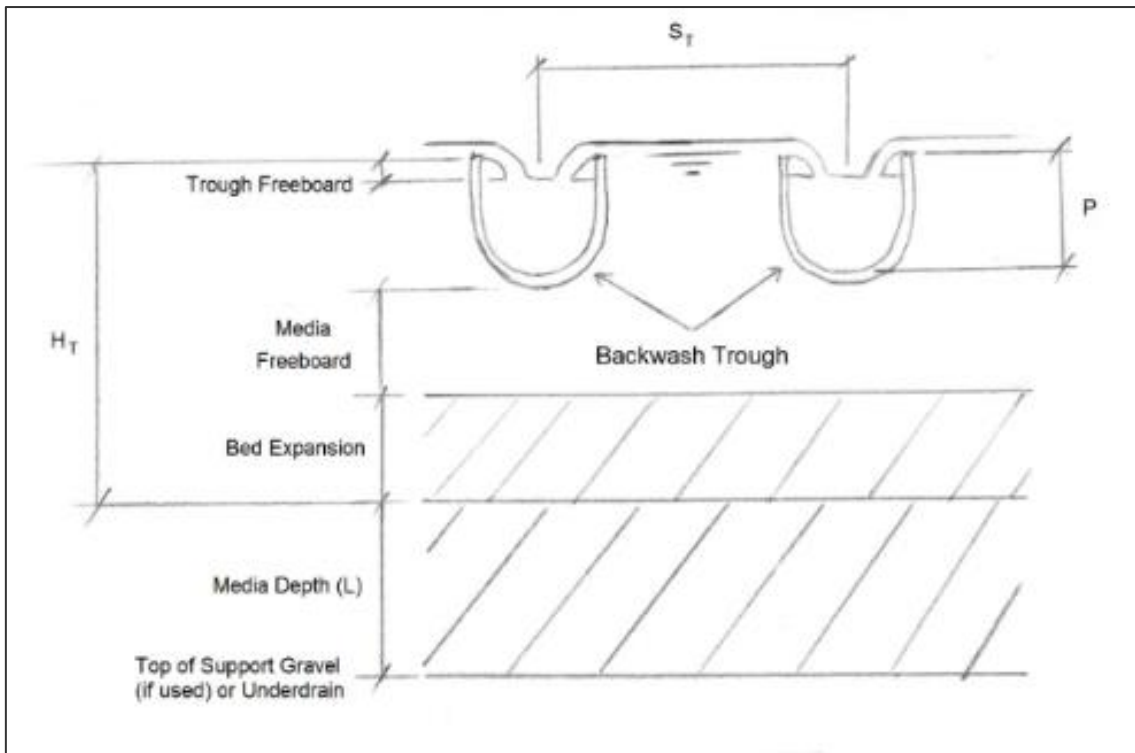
Height and Spacing of Backwash Troughs (adapted from Montgomery, James M. Consulting Engineers (1985))
